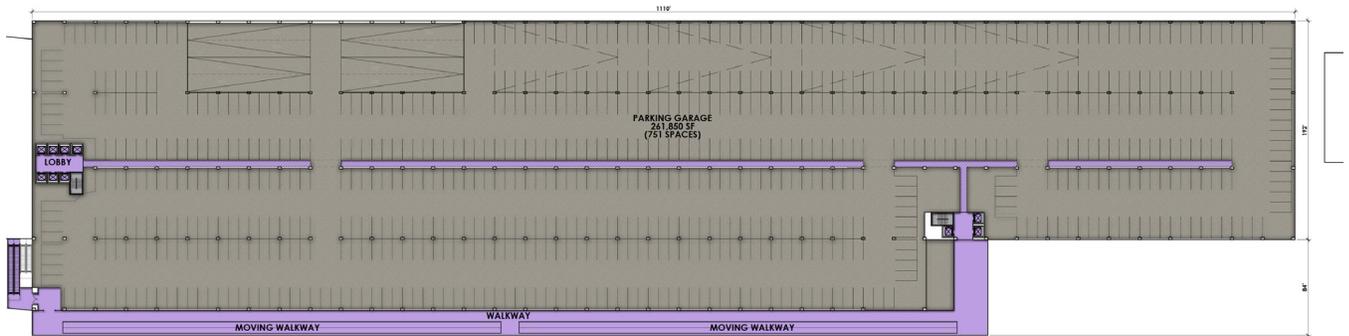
a-35 Plans for Parking Structures - Garage Grade Level 10 Plan
